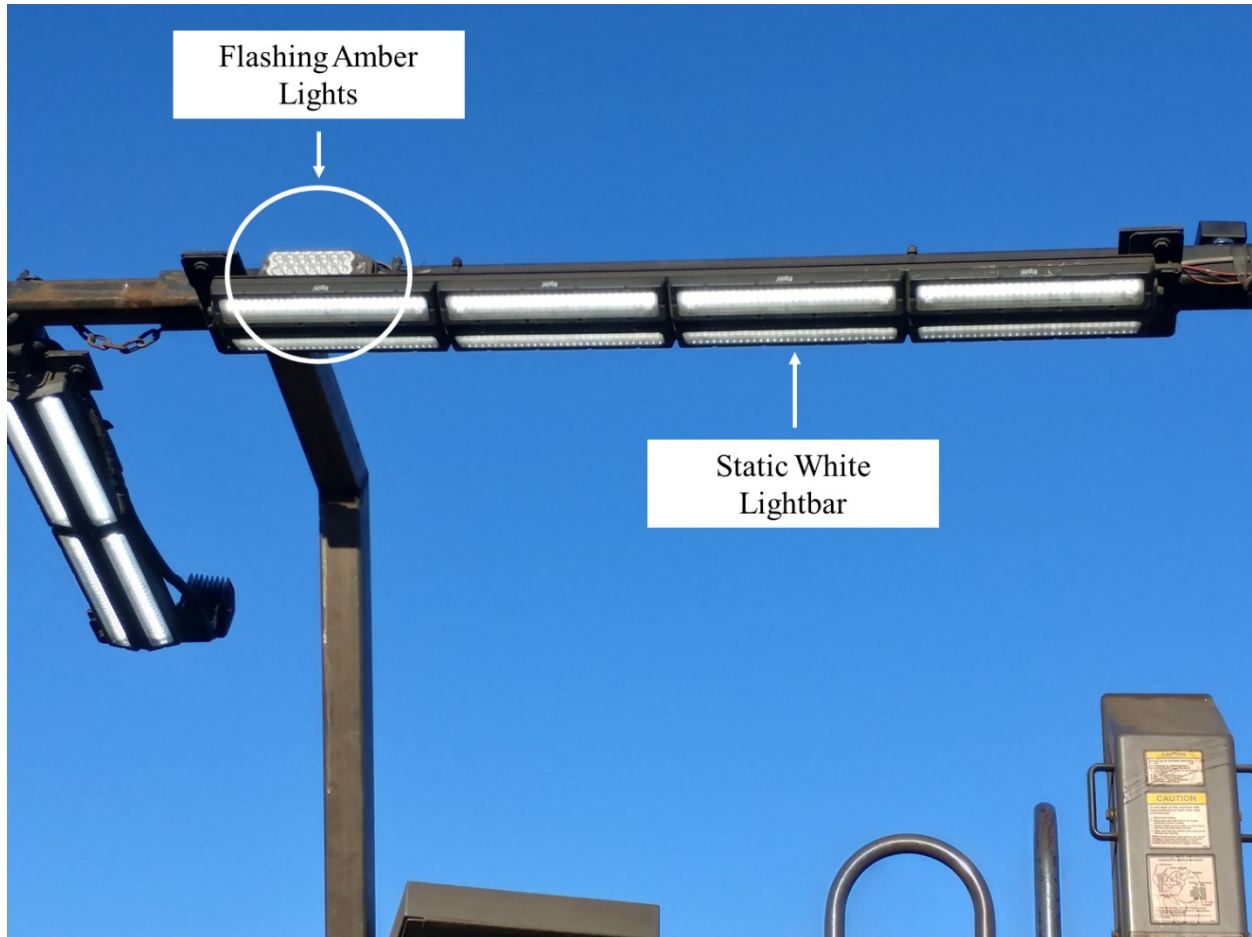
Amber light installed on paving equipment with static white lightbar (case studies 1 and 3)
